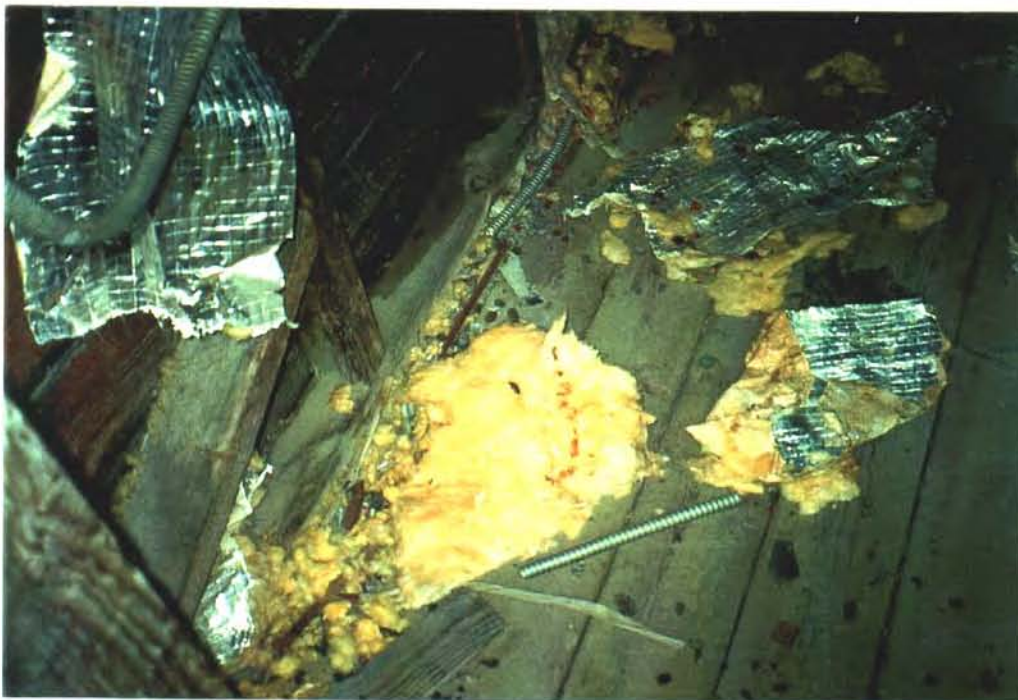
Insulation in the electricity shed, adjacent to the conveyor structure at the Loading Facility at the Calumet 1-15 dump.
